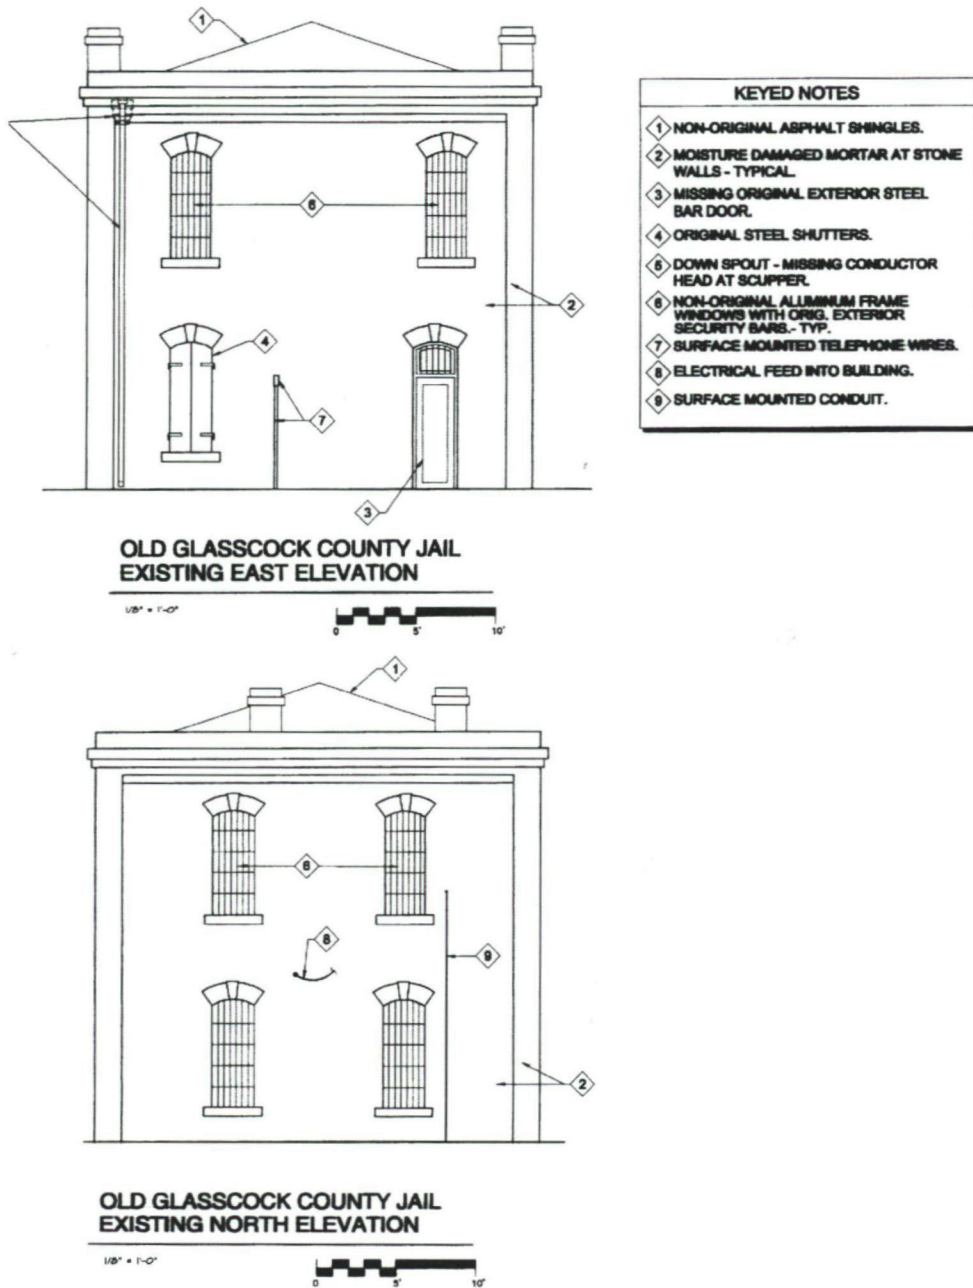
Glasscock County Courthouse and Jail Building elevations.
